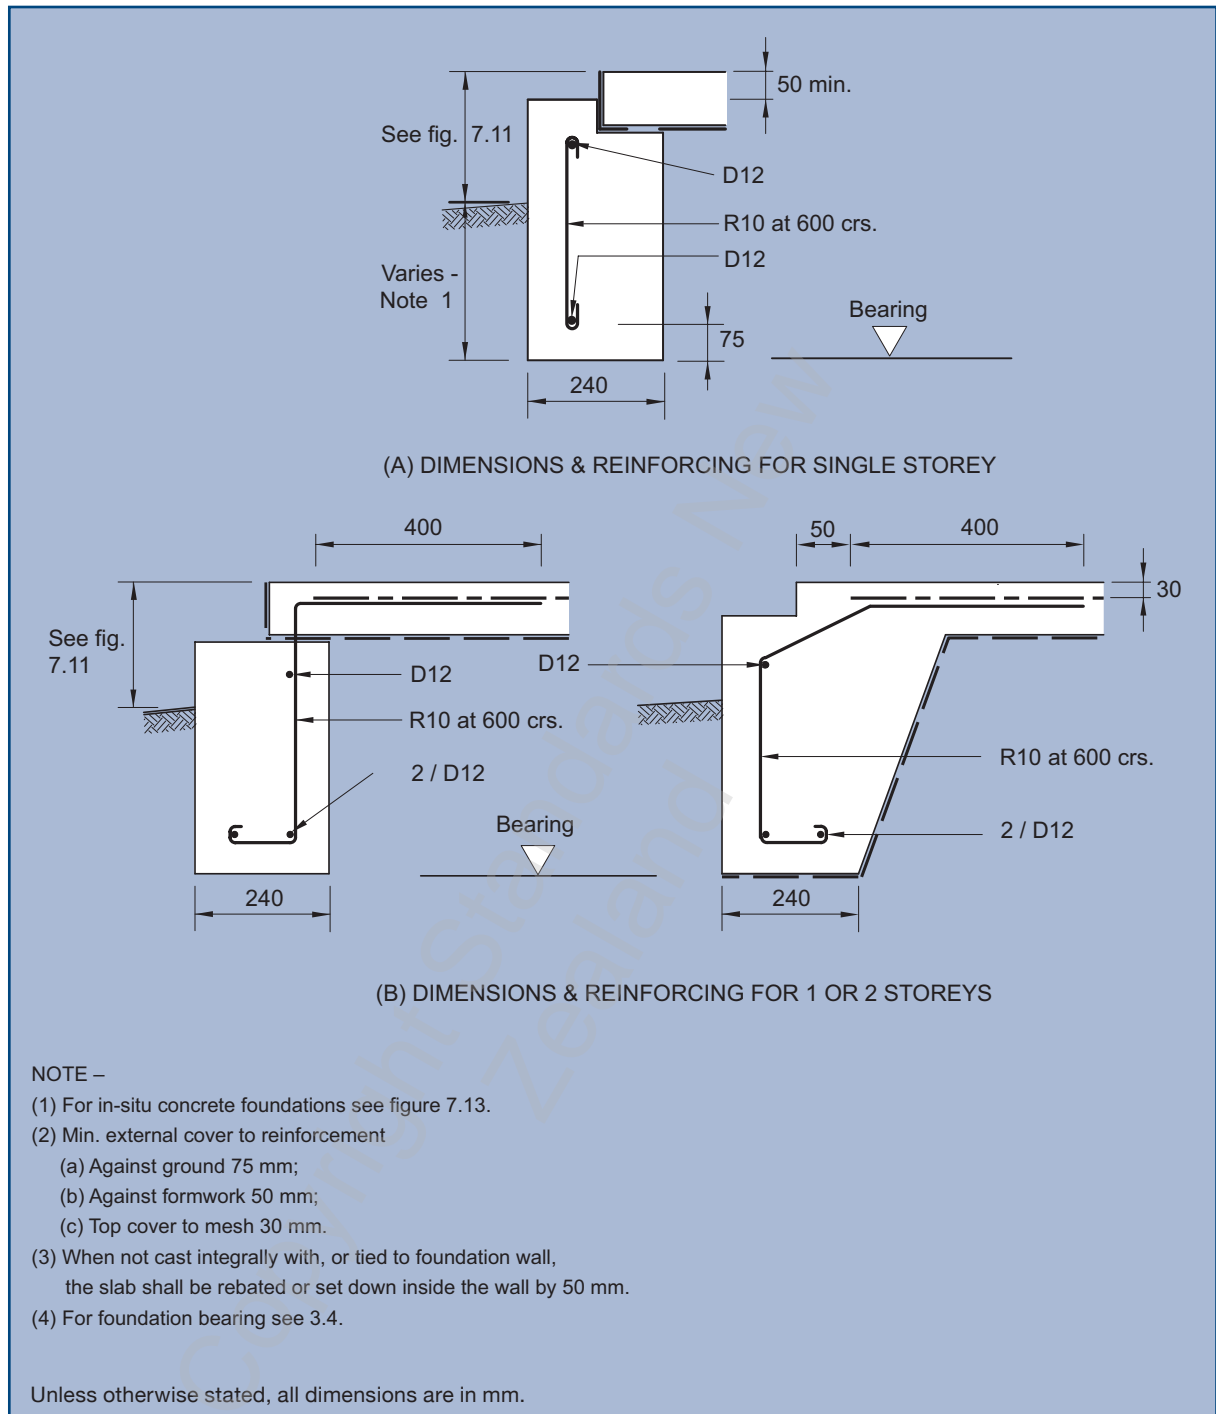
Masonry veneer foundation edge details – In-situ concrete (see 7.5.2.3)
